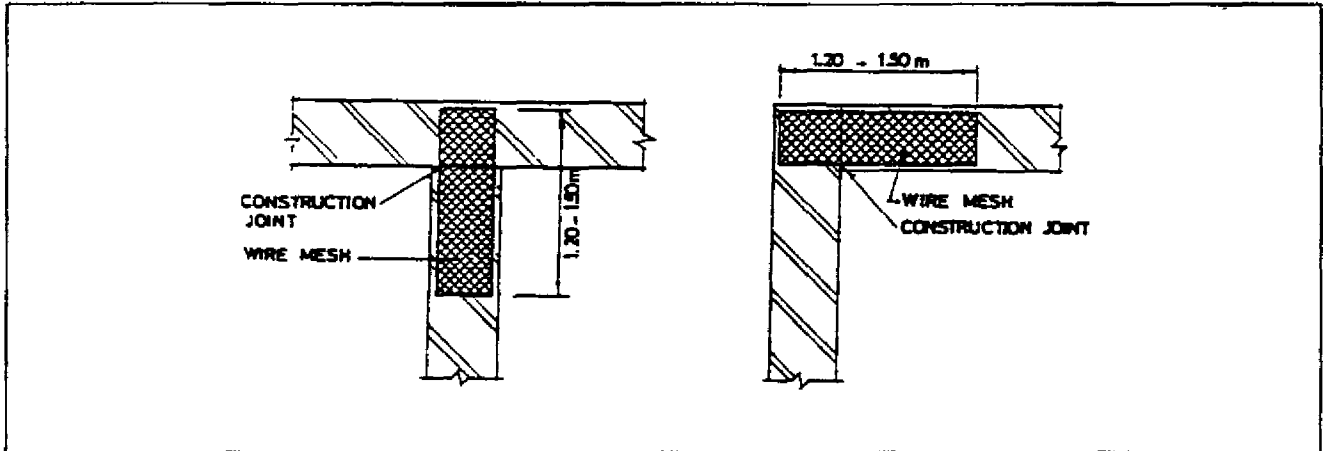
Horizontal Reinforcement by Wire Fabric at Junction and Corner [1]
